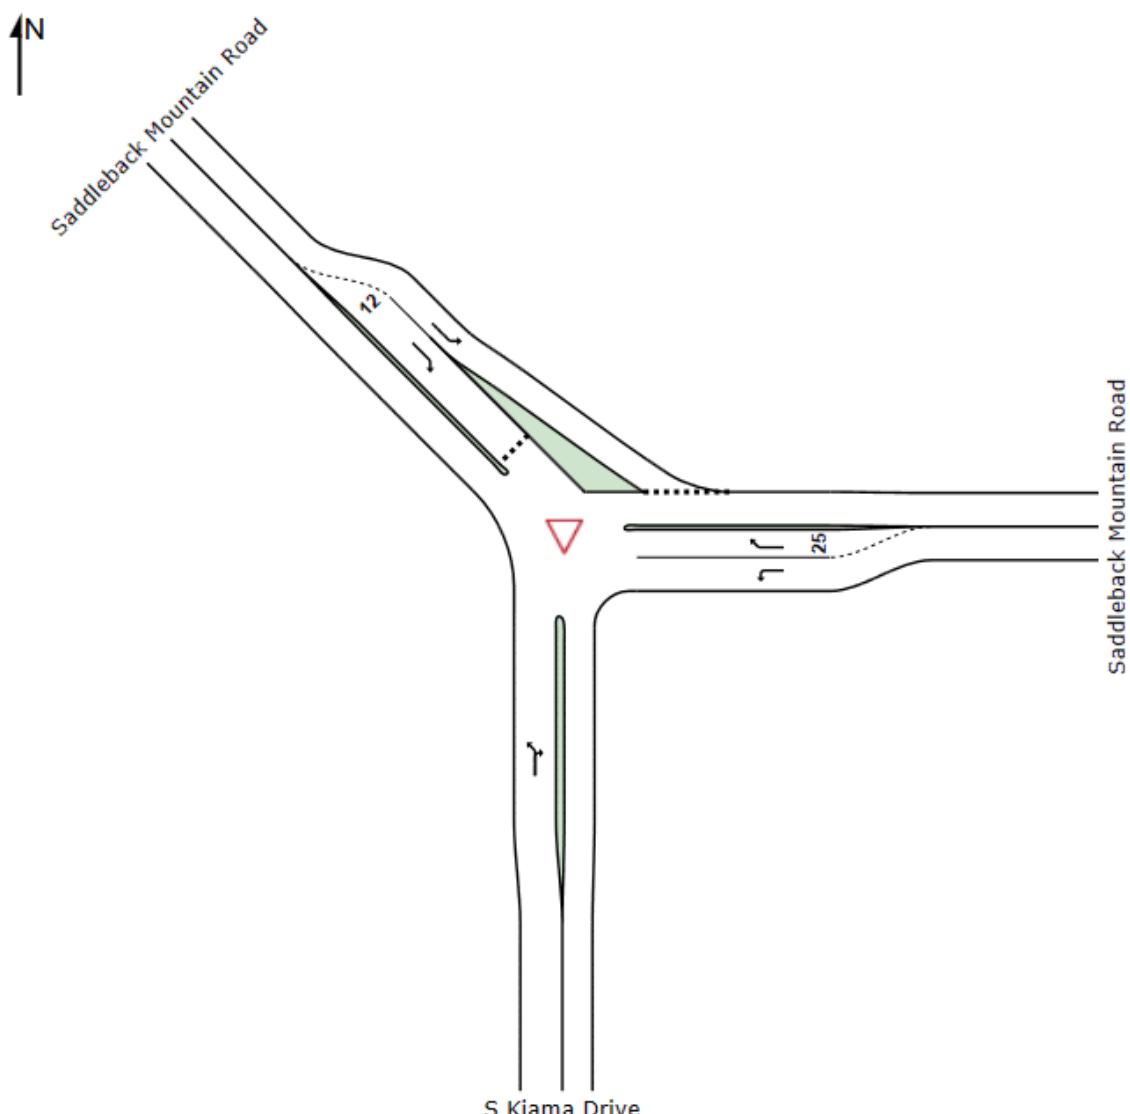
Saddleback Mountain Road / South Kiama Drive Intersection Layout
